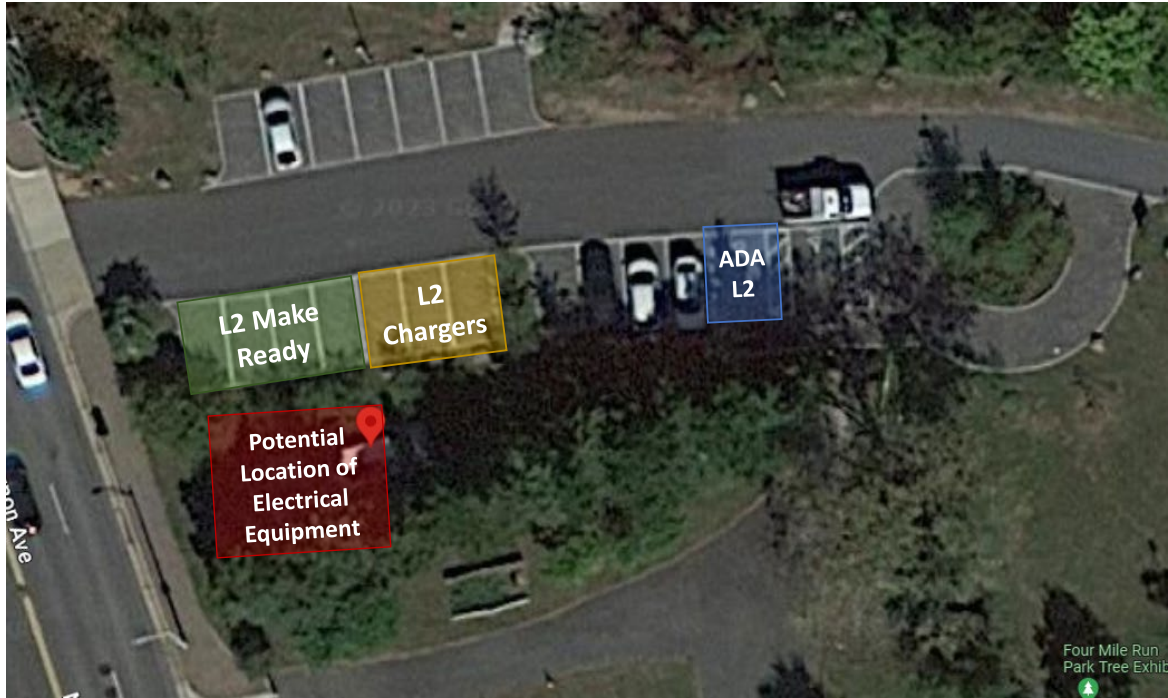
Proposed Four Mile Run Charging Installation Site Plan (Not to scale)
